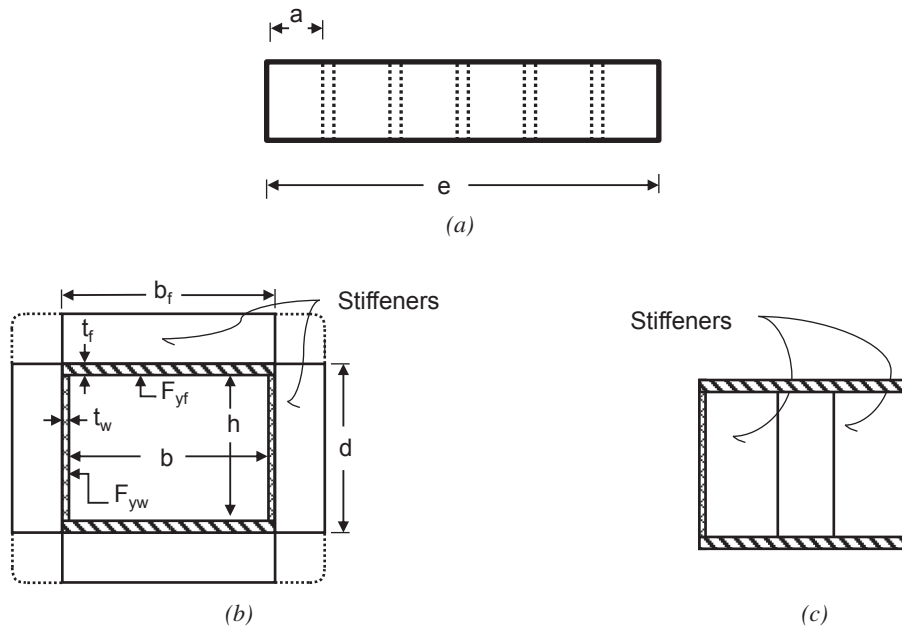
(a) Link layout and stiffener spacing; (b) cross-section with external stiffeners; (c) link cross-section with internal stiffeners.
